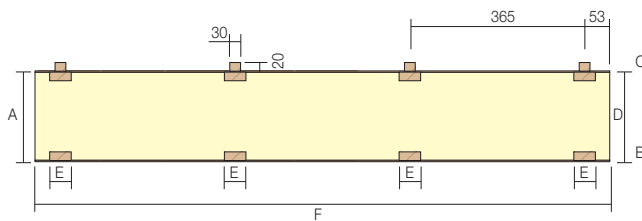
Illustration of *UNIDEK aero*® panel components. See Table 1 for component dimensions.
